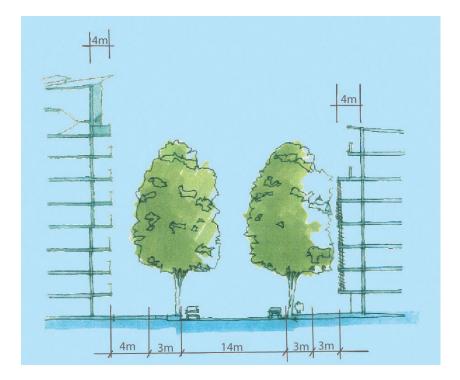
Type E tower element building as viewed from Morton Street looking north
